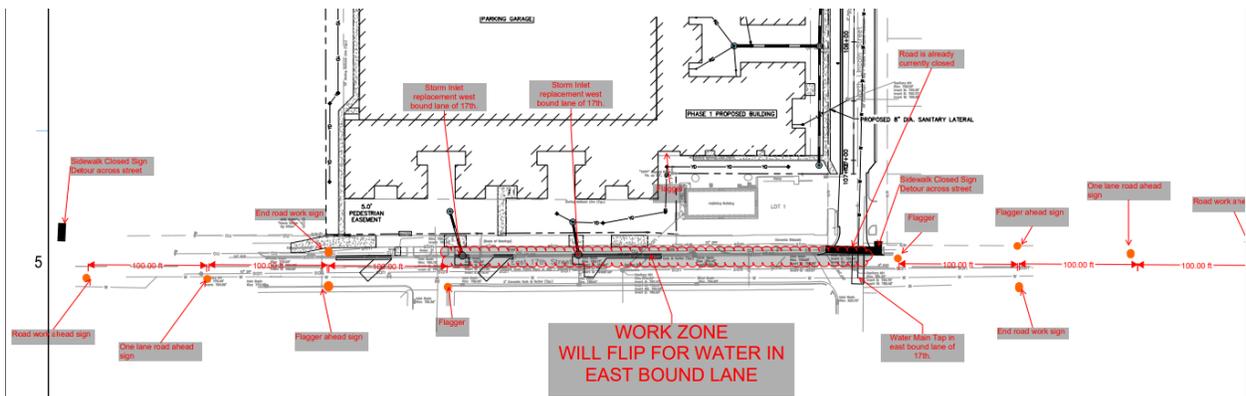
Approved temporary traffic control plan showing mid block crossing on E 17th from the east side of N Lincoln.
